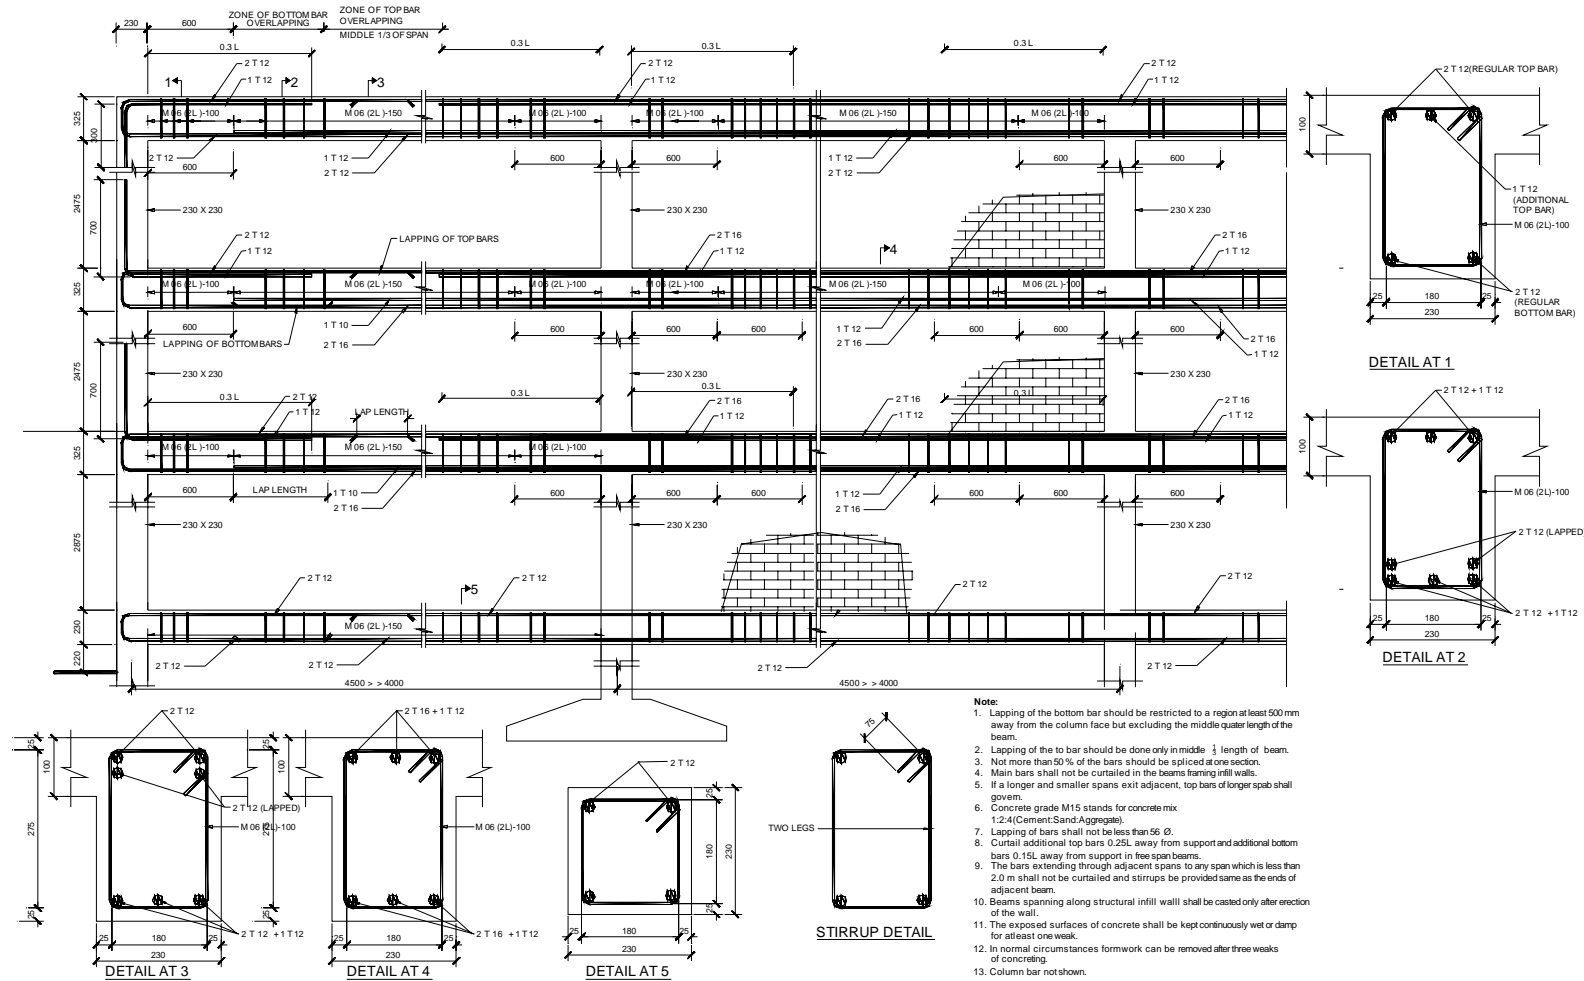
Beam Detail (two walls each way / 60 m²)
